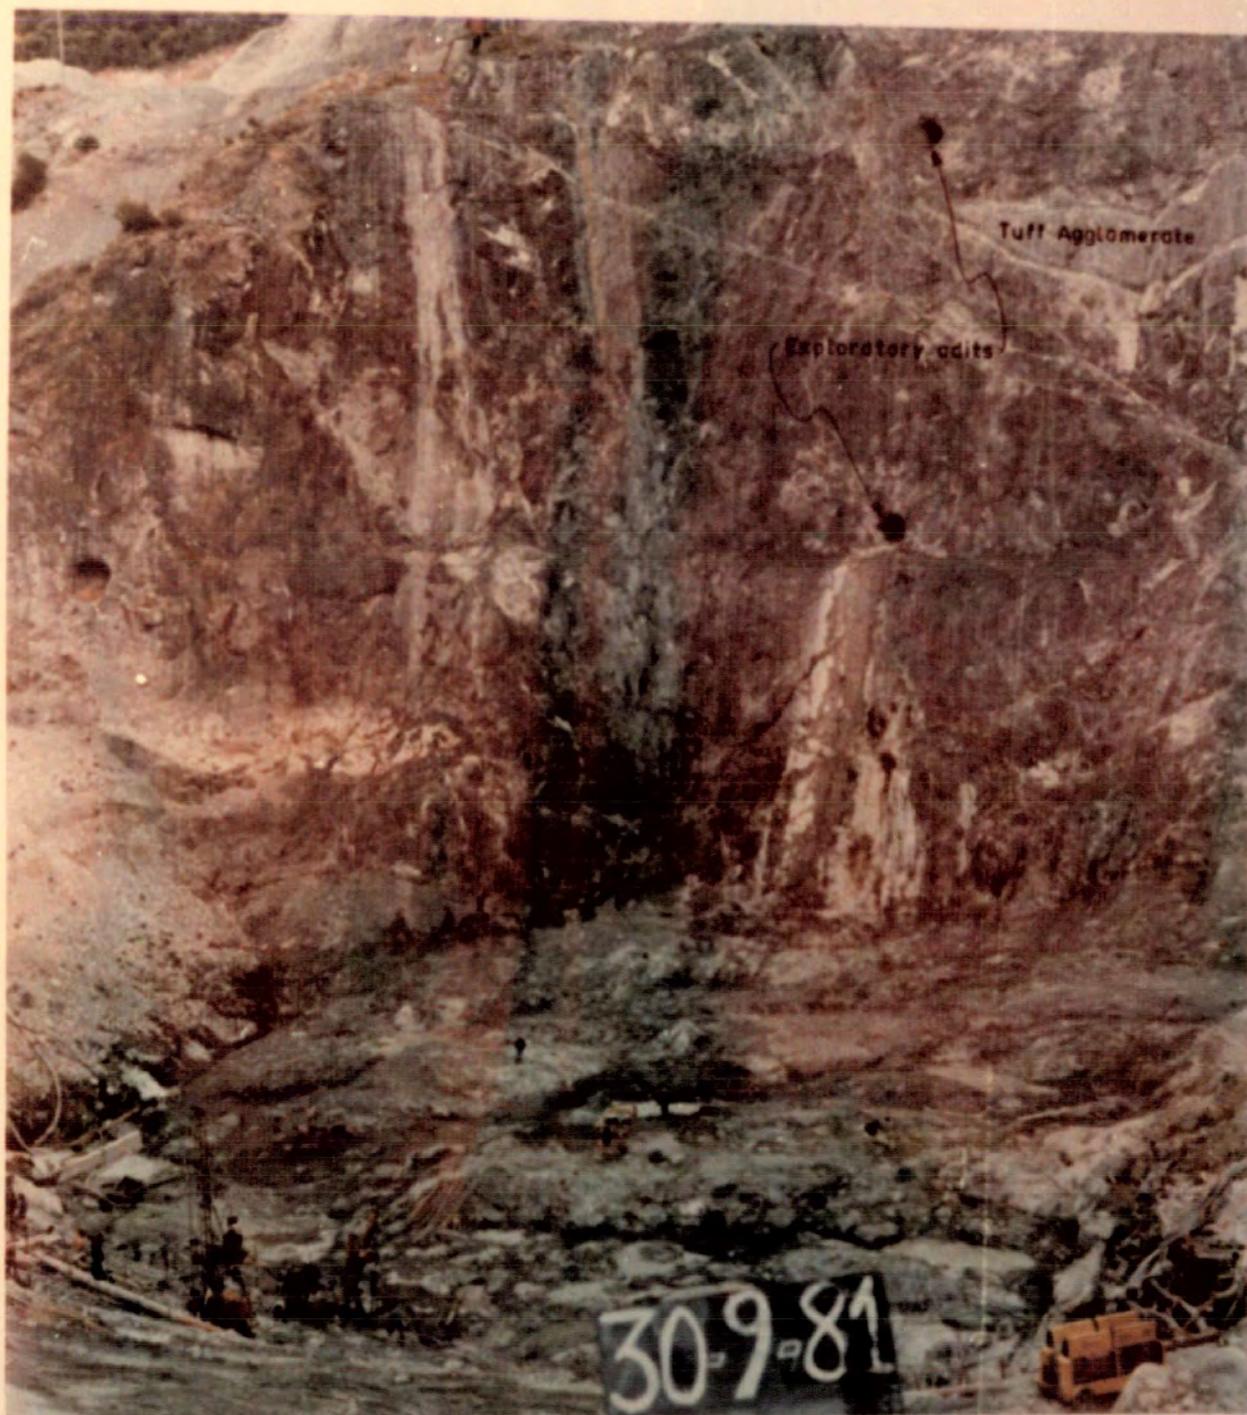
River bed and right abutment core trench excavations ( Assomata dam)
